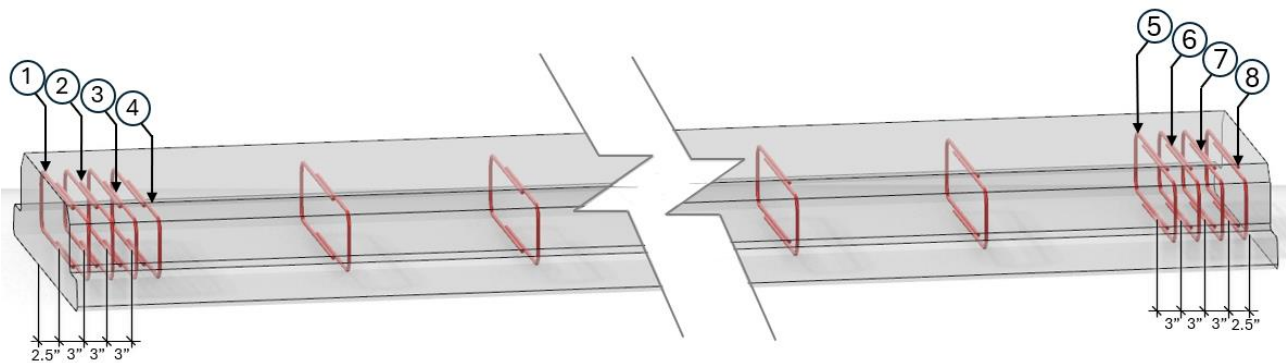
Instrumented type-4D reinforcement pairs at each specimen
